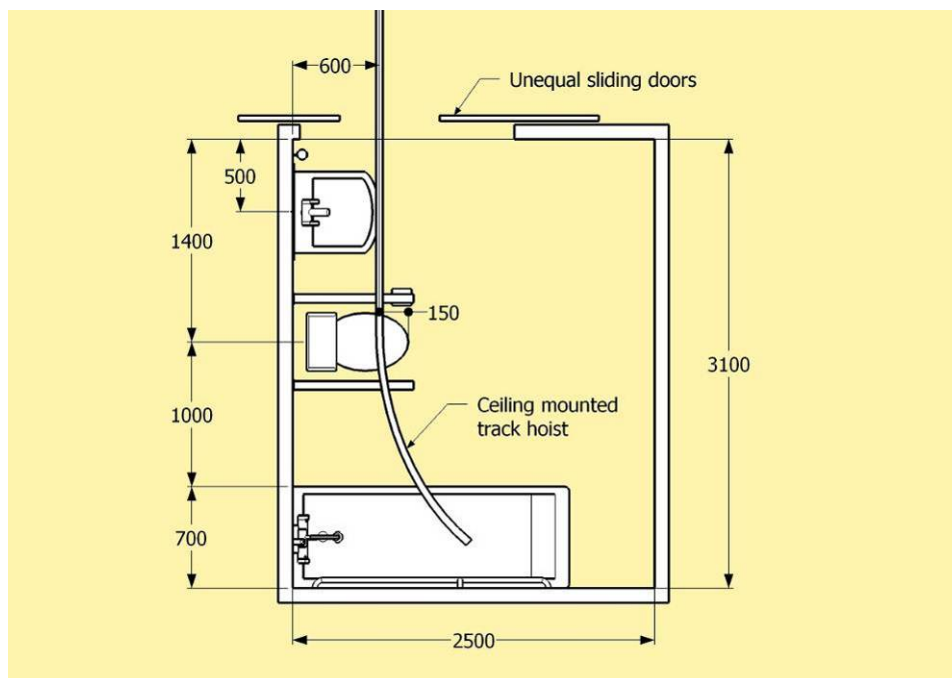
Example of a bathroom with a ceiling mounted tracked hoist for independent or assisted use
